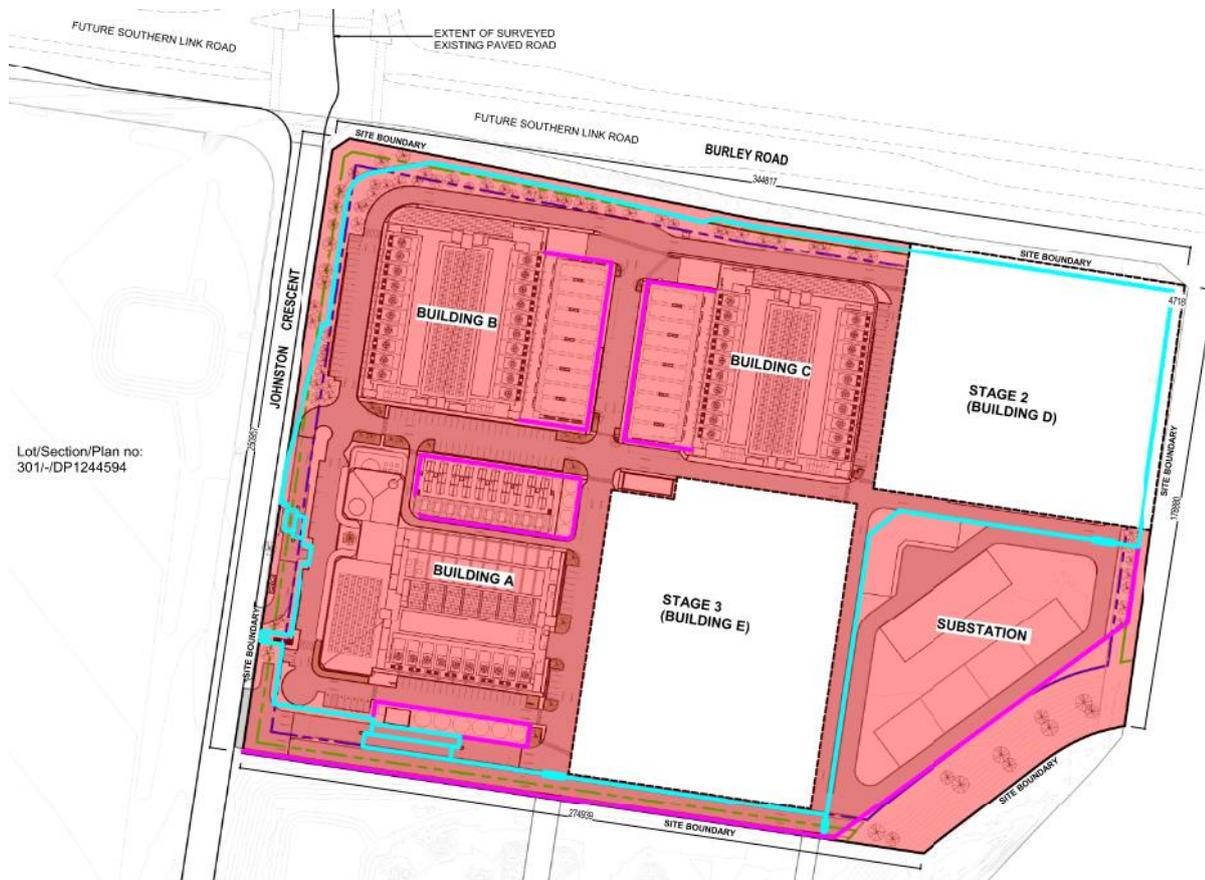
Proposed Staging Plan. Source: HDR Architecture (01/03/2024)
